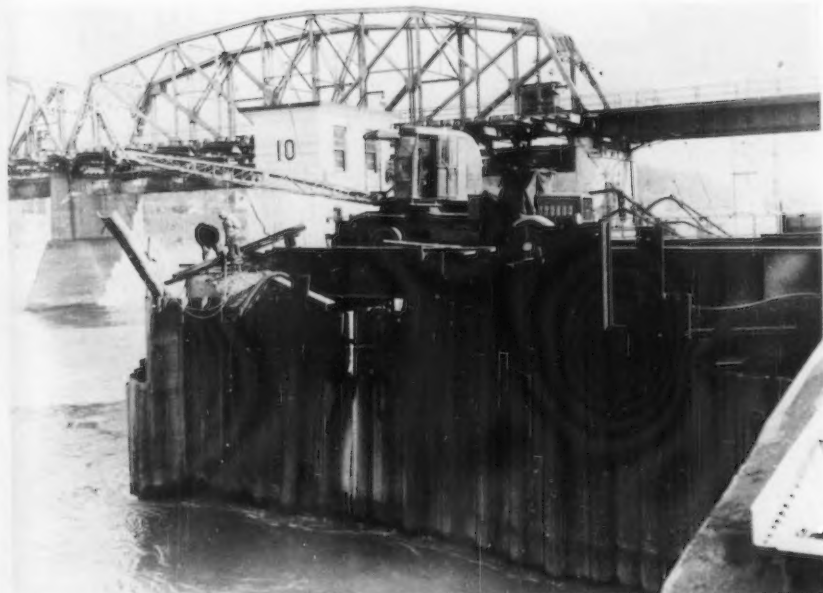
Major Repair Work is Performed in the Winter. Note Special Type of Deep Steel Sheetpile Cofferdam in Foreground. Truck Crane on Temporary Bridge Placed Over Lock. Note Pump Outlet Hose Back of Truck Crane and Movable Dam in Full Open Position.
